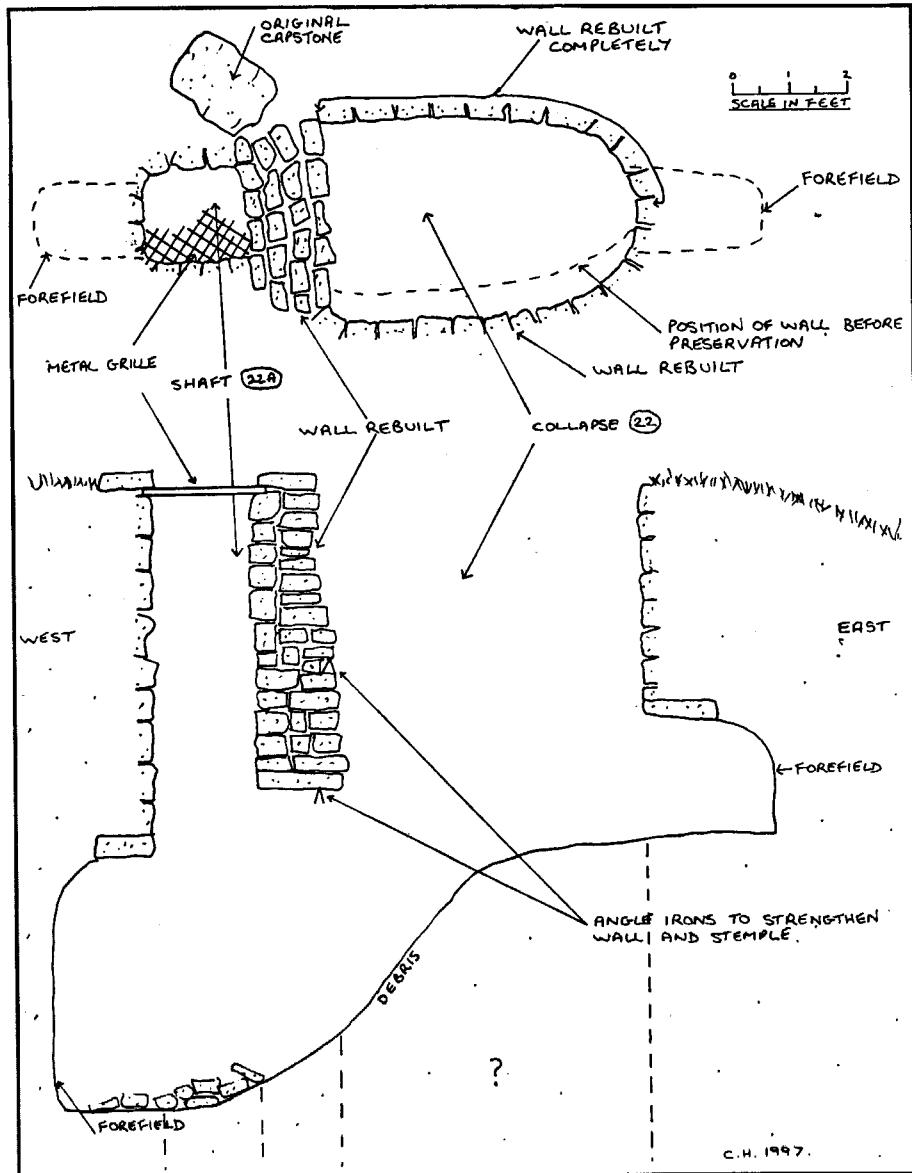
Sketch plan and elevation showing features 22 and 22a.
